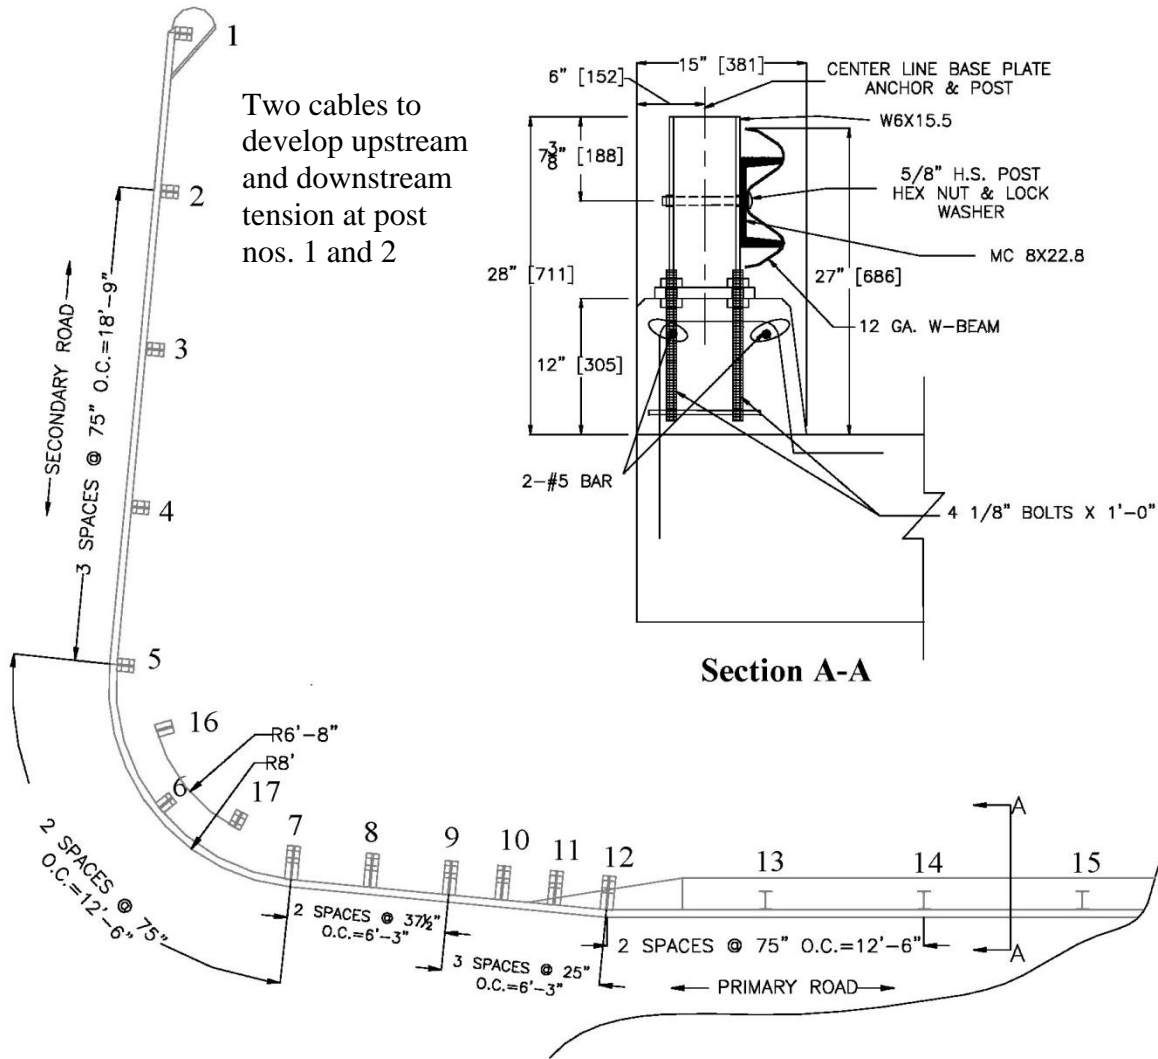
Yuma County Short-Radius Guardrail System Final Design Details [6, 27]
